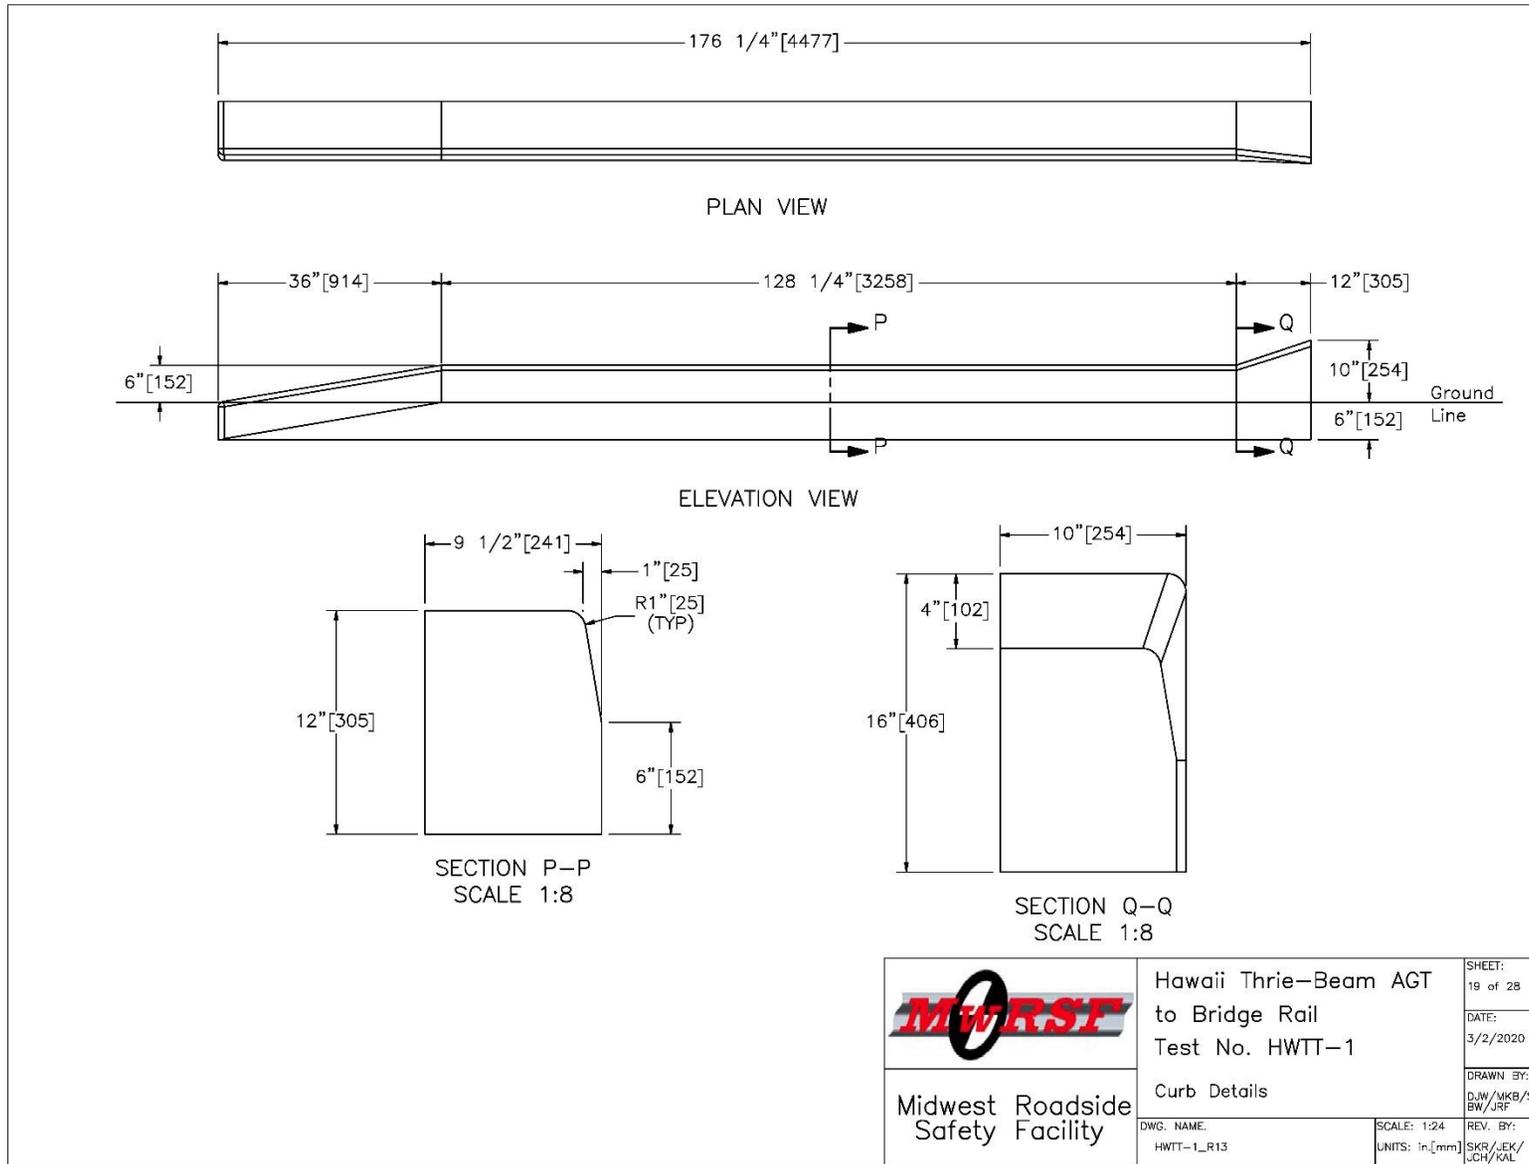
Curb Details, Test Nos. HWTT-1 and HWTT-2
